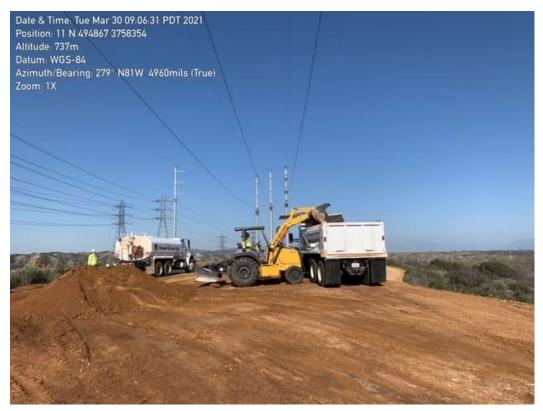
Grading and soil export at Construction Area 4X55, Segment 4 (March 30, 2021) (Photo courtesy of SCE).
